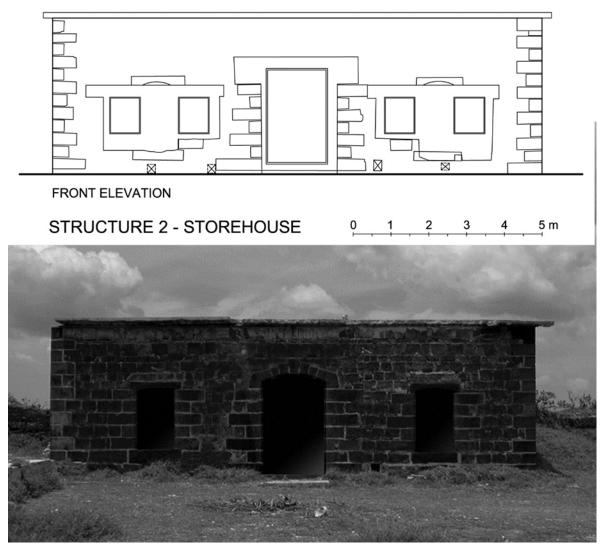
Storehouse on Ile de la Passe as it was in the 1990s and, below, a virtual reconstruction by Françoise Summers of the original French elevation as Pike would have seen it.
